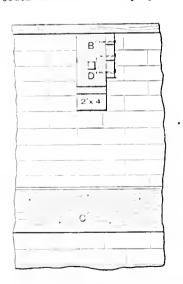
Front Elevation of Wooden Lookout Secured to Wall.
